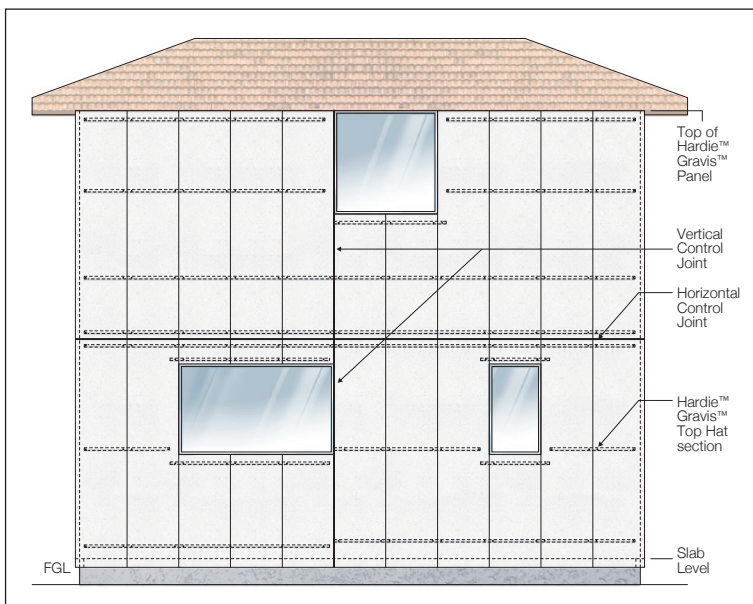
TWO STOREY LAYOUT - HIP ROOF ELEVATION
